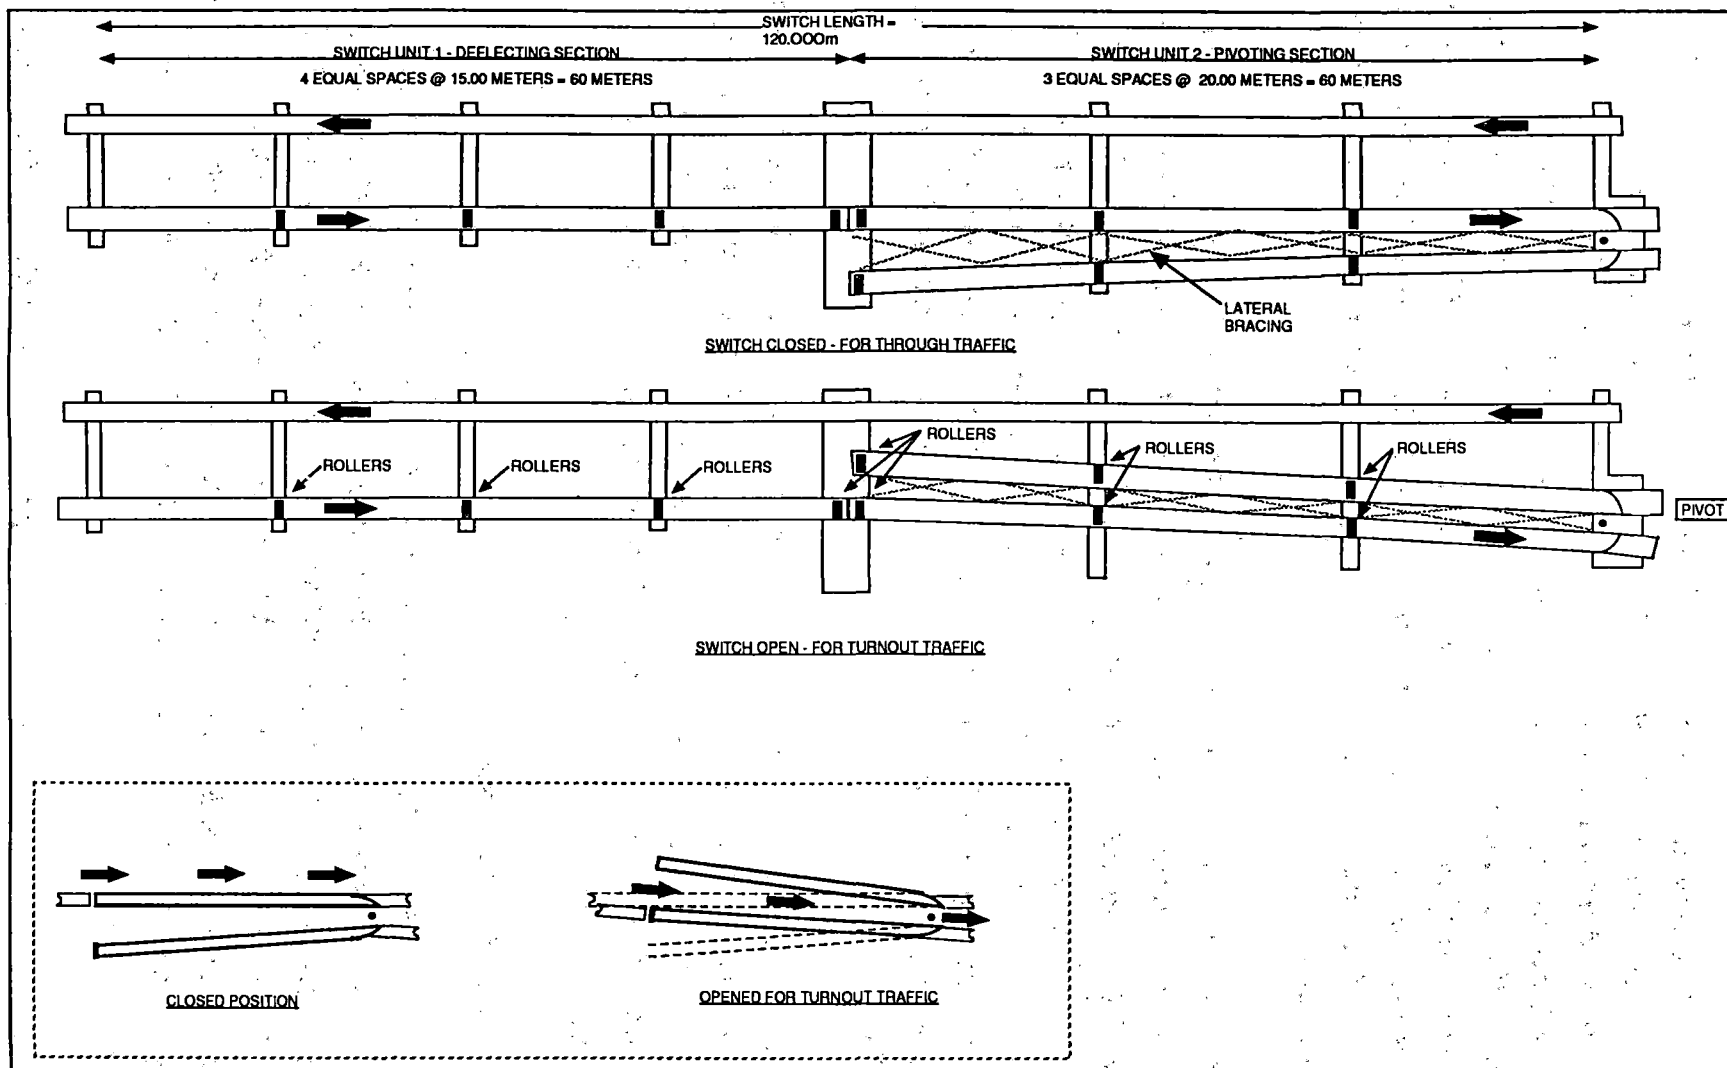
GRUMMAN SWITCH LAYOUT
